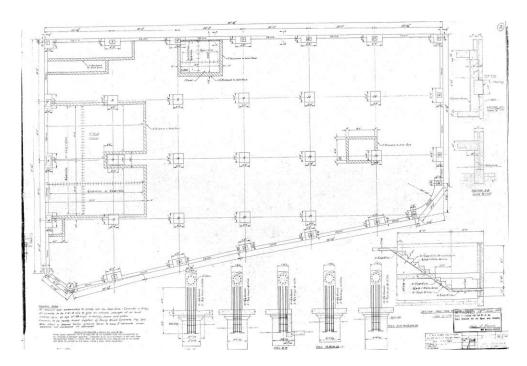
1948 – Plan of footings for W & A Gilbey Ltd Factory, by C. Orme, architect, and A. S. Nicholson & H. R. Hammond, consulting engineers, approved 18 June 1948. The plan shows the locations of 'brickwork to solid rock' (Source: City of Sydney Archives, Pyrmont Bridge Rd NW cnr & Pyrmont St (adjacent No 135), new building (01/01/1947 - 31/12/1947), [A-00572010]. https://archives.cityofsydney.nsw.gov.au/nodes/view/1437047)
